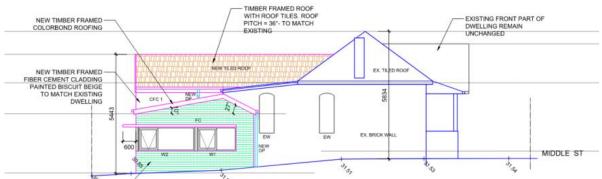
Proposed east elevation plan (Source: City Rhythm Pty Ltd)
